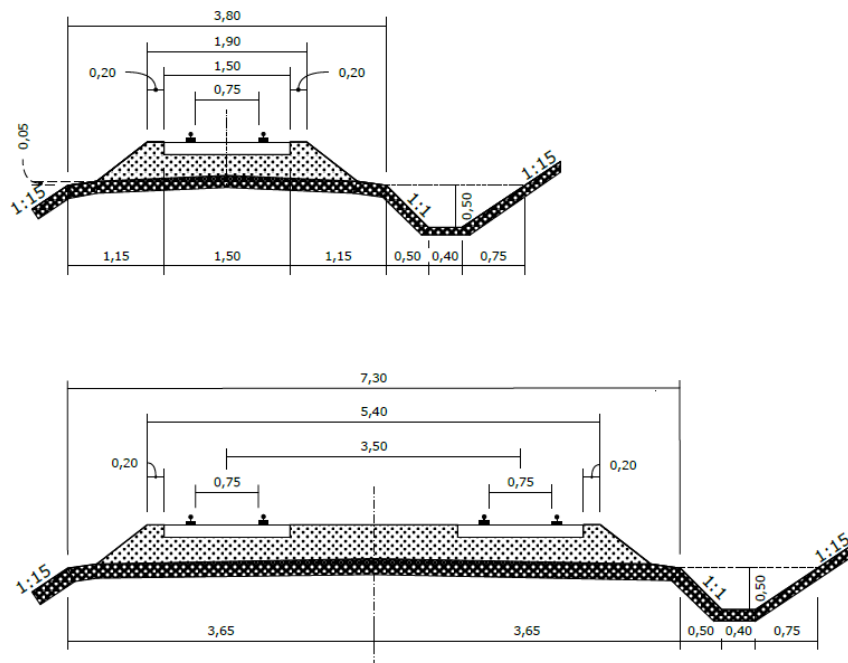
Standard cross-sections of the track substructure and guideway in [m].
